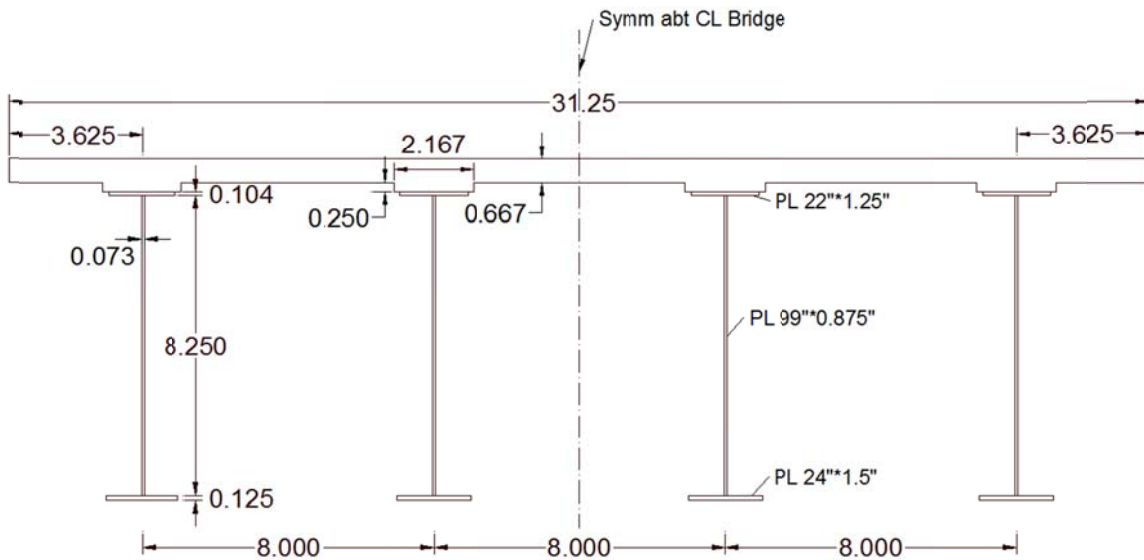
Typical steel I cross section (1) for L = 240ft
